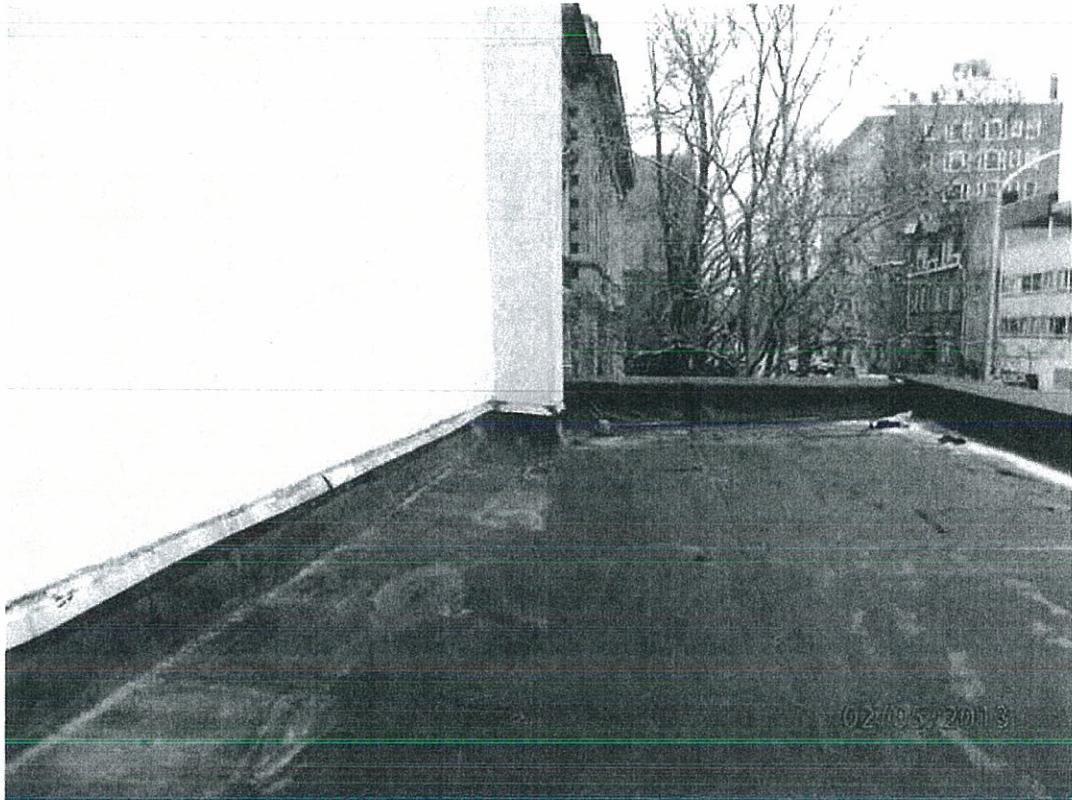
Roof View 2140 Market Street, Philadelphia, PA
